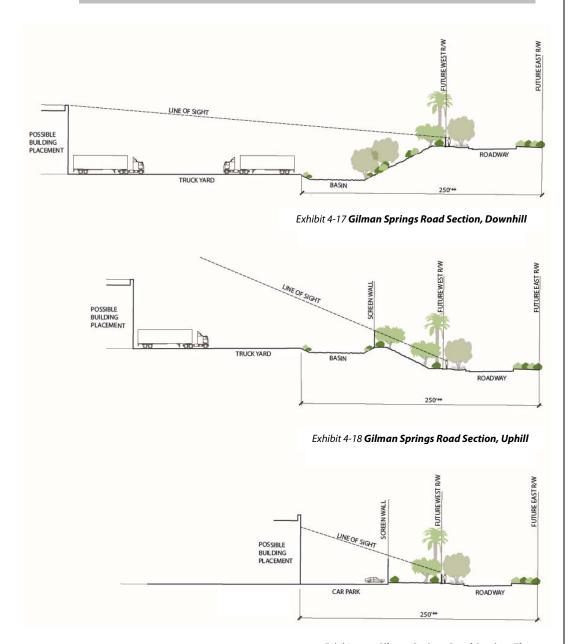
Gilman Springs Road Section, Flat
